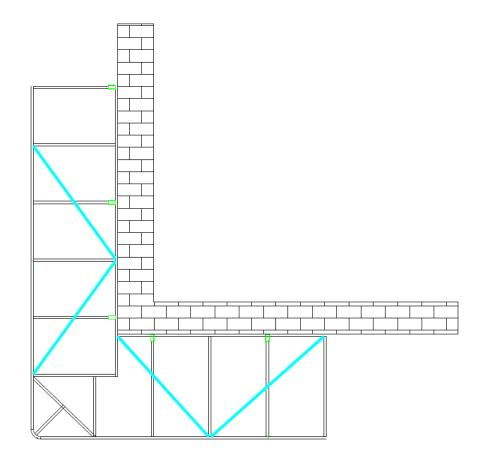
Fix the Rack Frame to the Wall (Top View)
